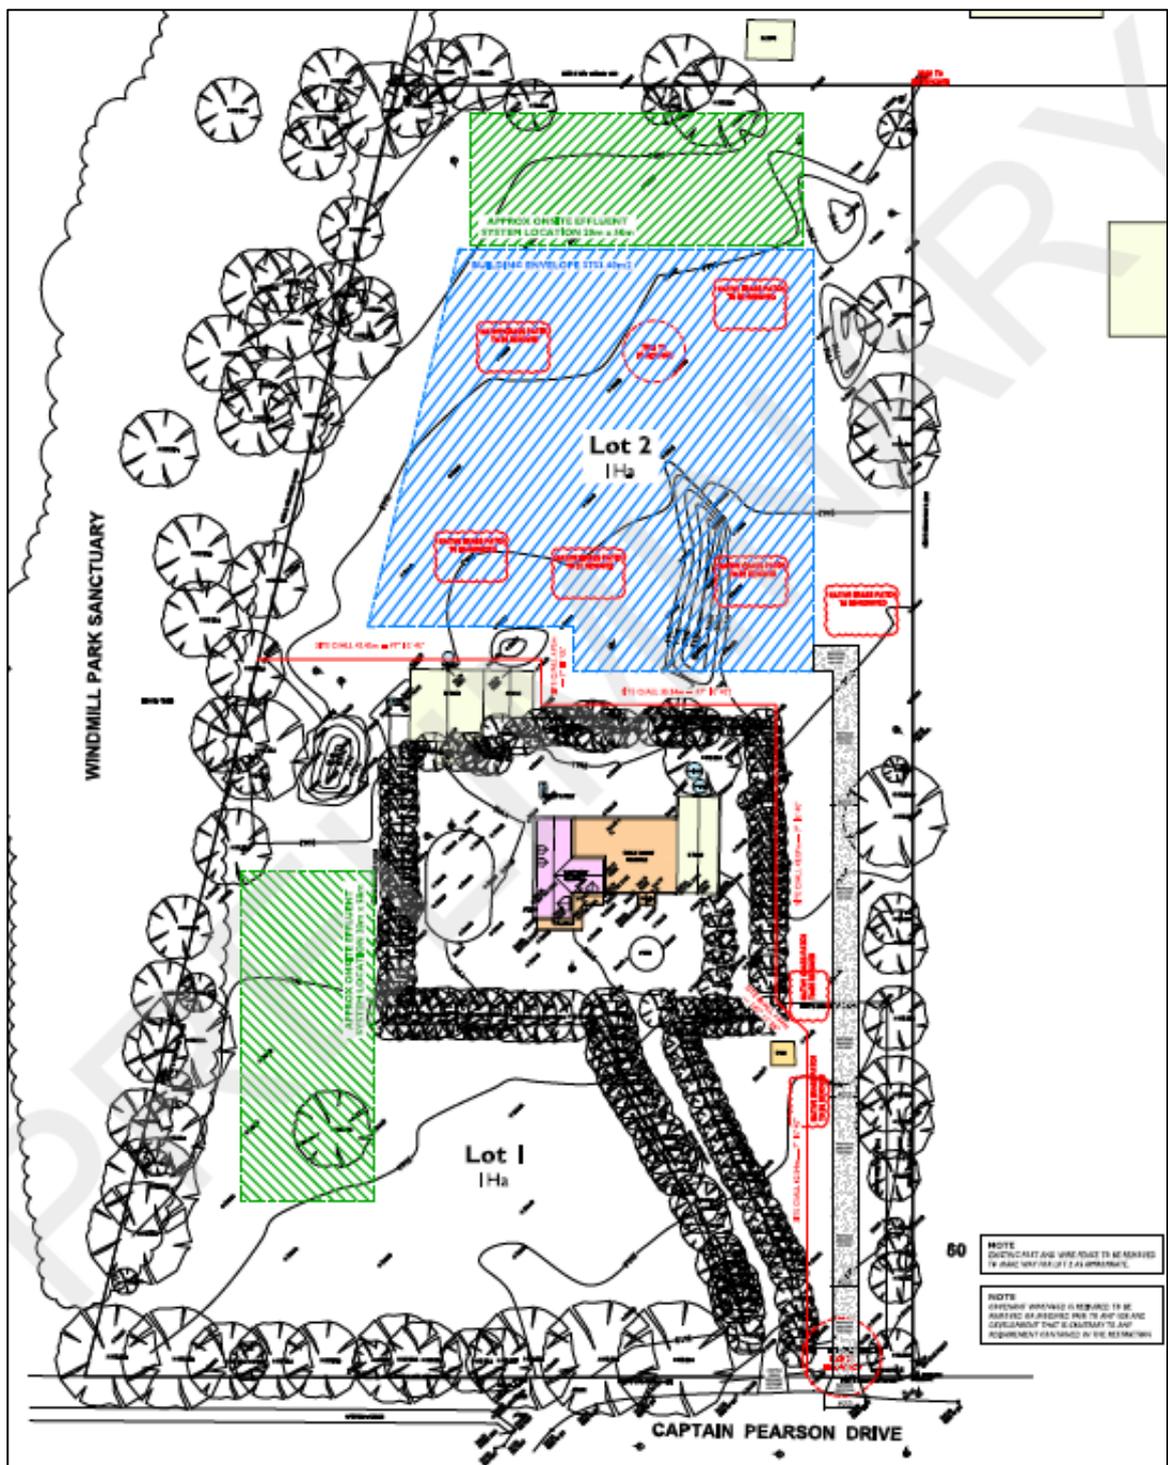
Excerpt of proposed subdivision layout plan (Source: Jova Drafting Consultants)
